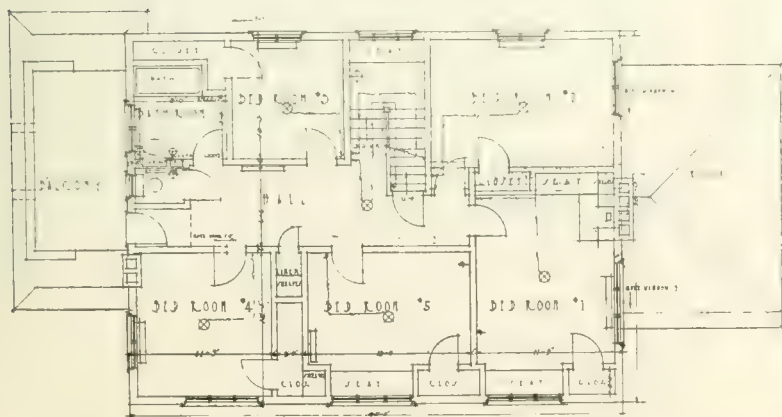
Bedroom floor of house shown in Fig. 9.
